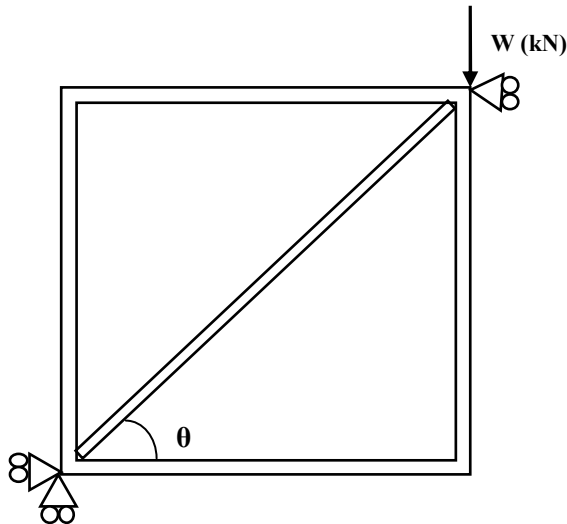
Web panel of steel plate-girder with a diagonal stiffener
